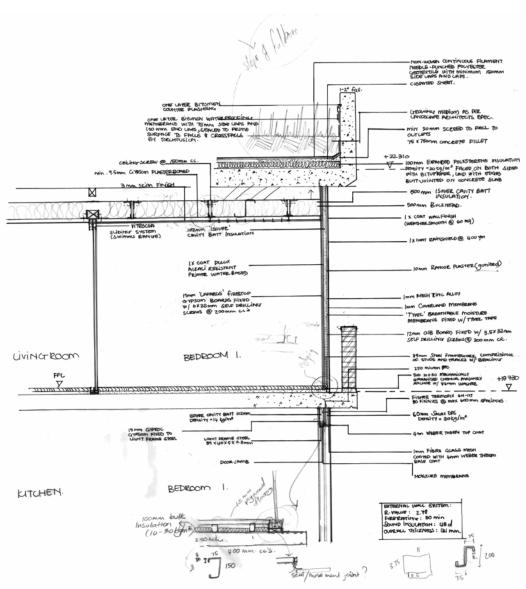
Sketch of green roof perimeter detail (Author, 2020)
